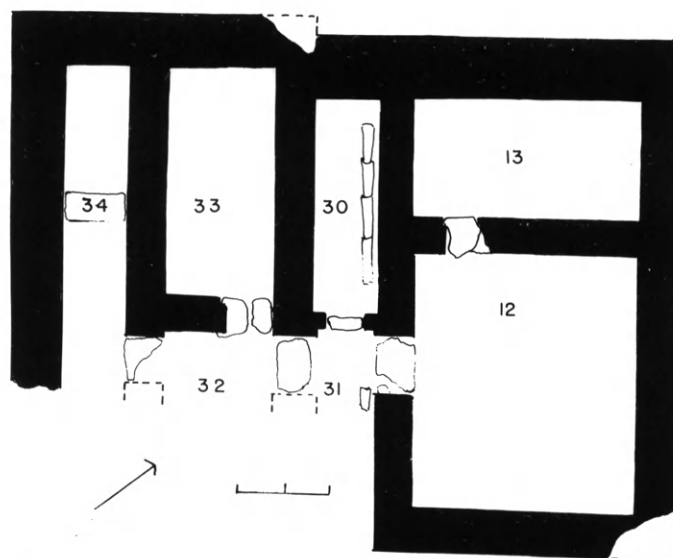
Plan of the basement rooms of the «Potter's Shop» at Zygouries as restored by C.W. Blegen (*Zygouries*, fig. 25).
